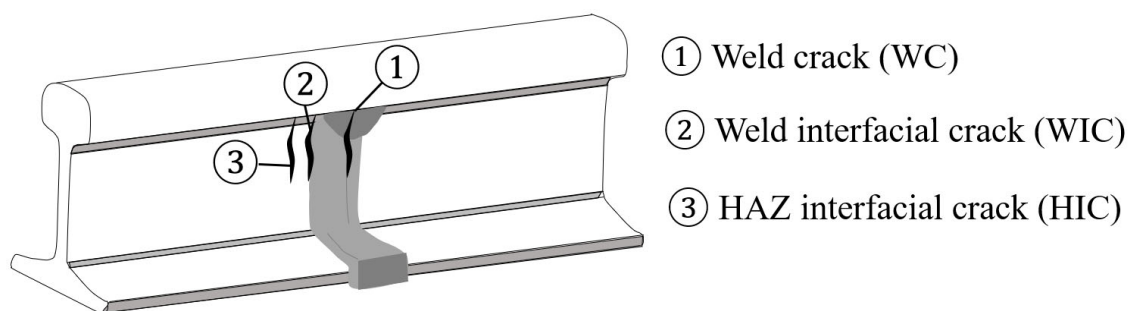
Different initial crack location of thermite welded rail joint
